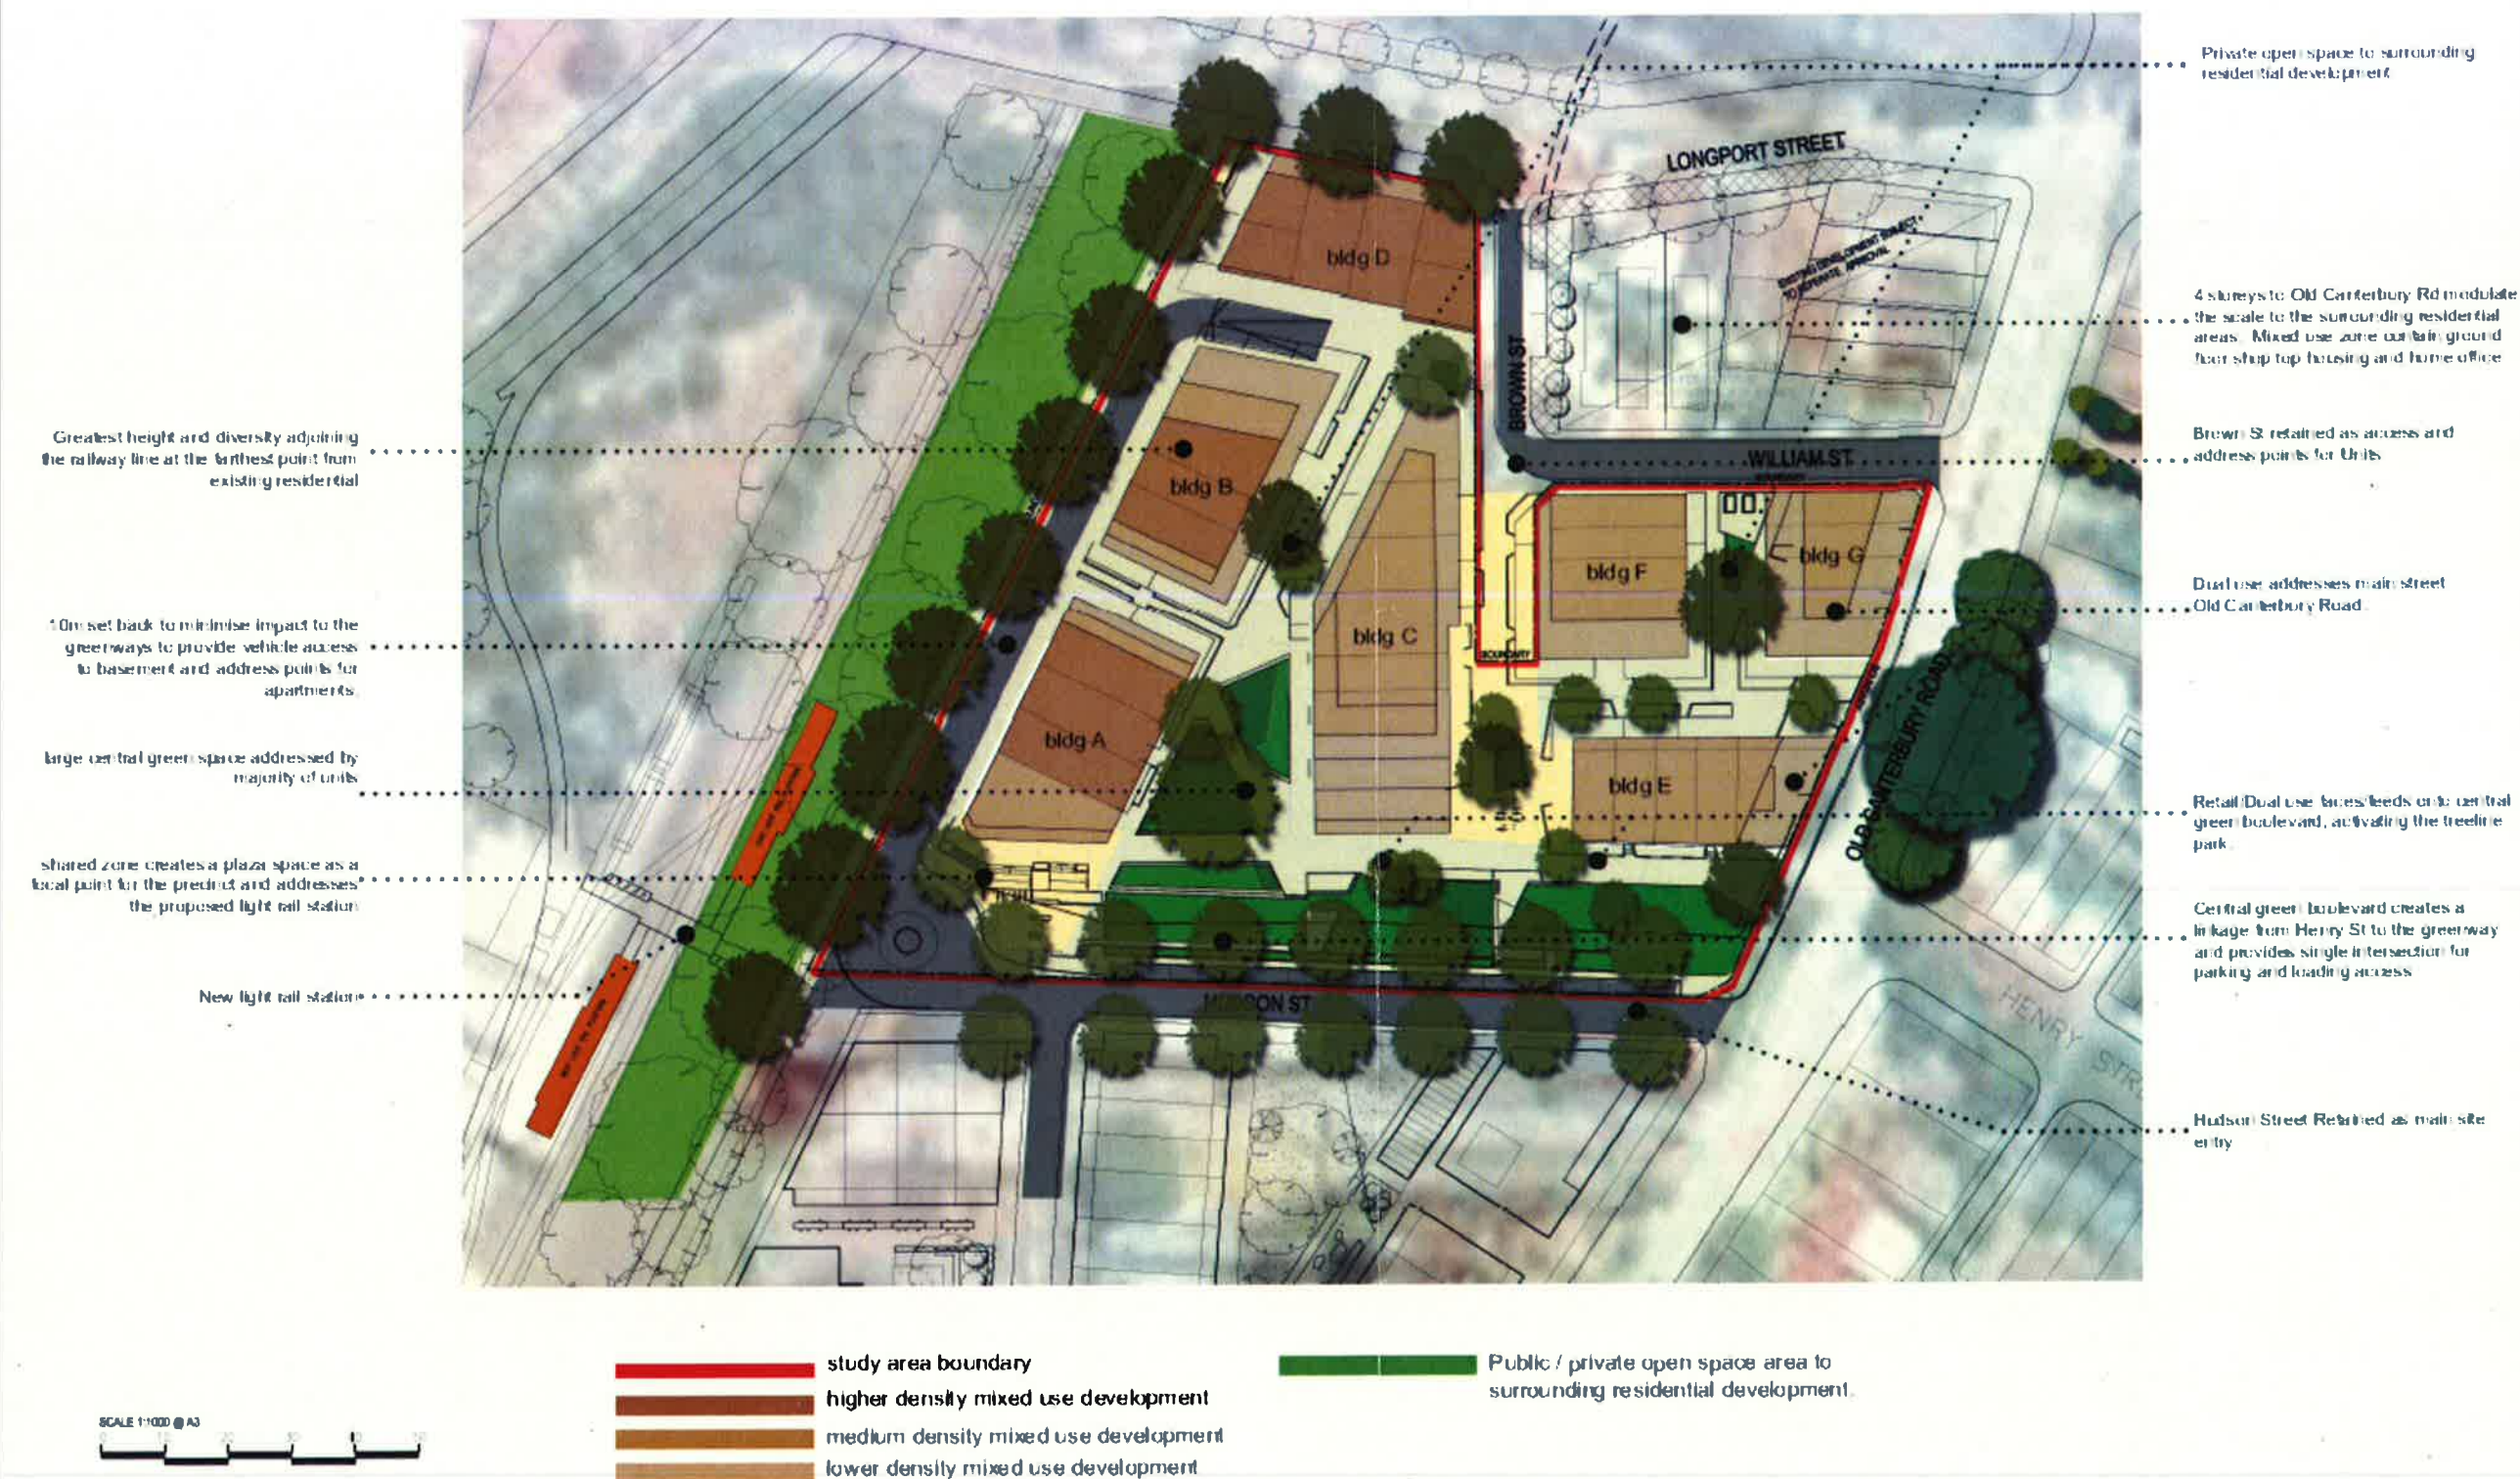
Proposed Concept Plan (Source: Proponent's Section 75W application)
